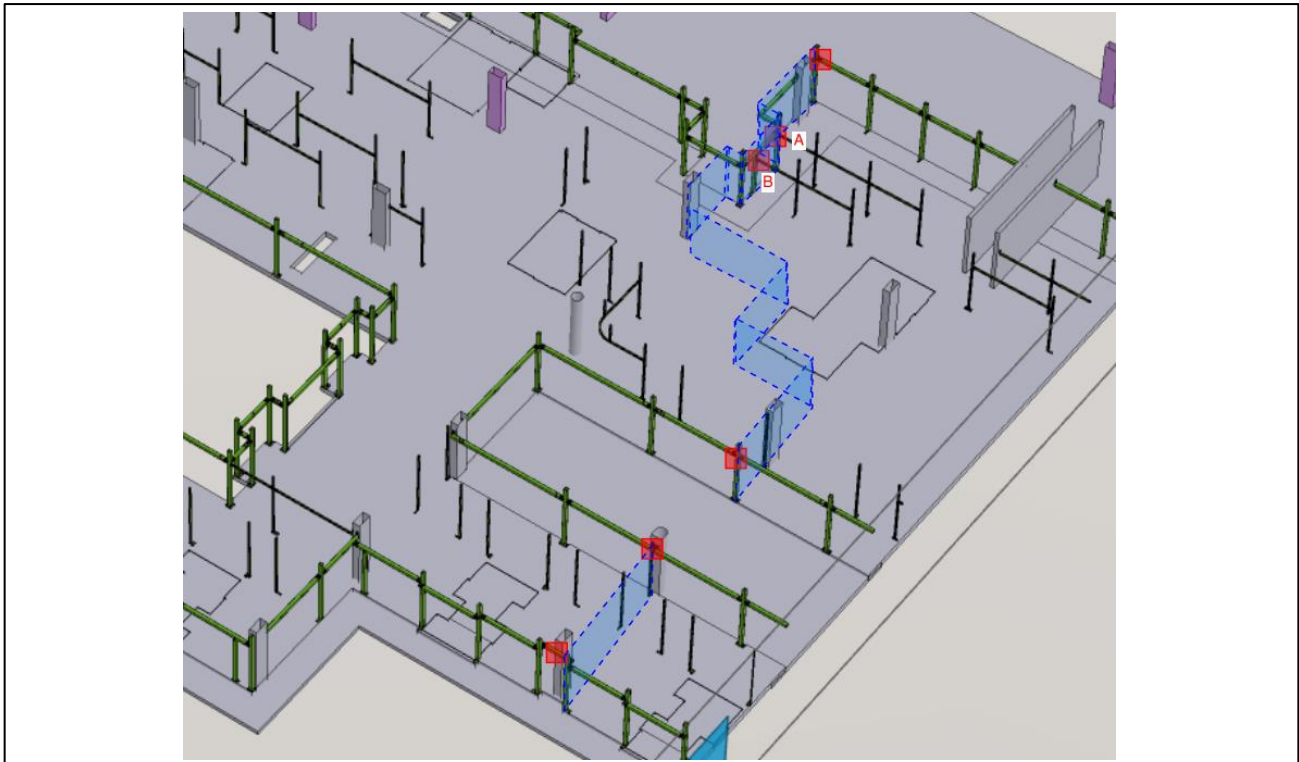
Steel heard beam locations penetrate fire rated lining – Lower Ground
